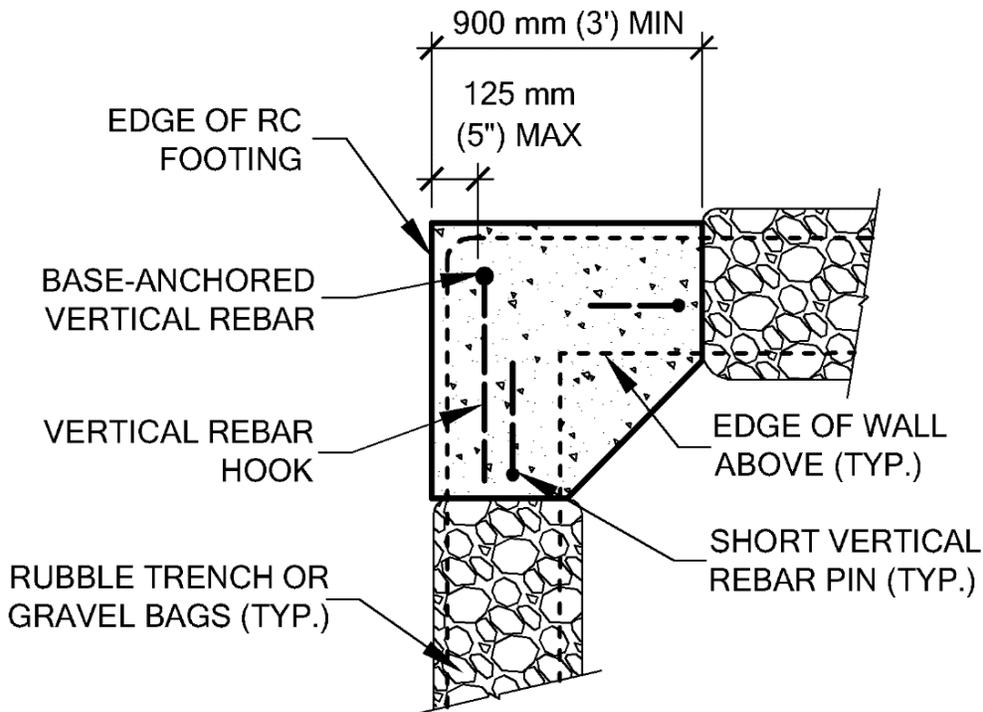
Spot footing to anchor short vertical rebar that will use a covered splice.
